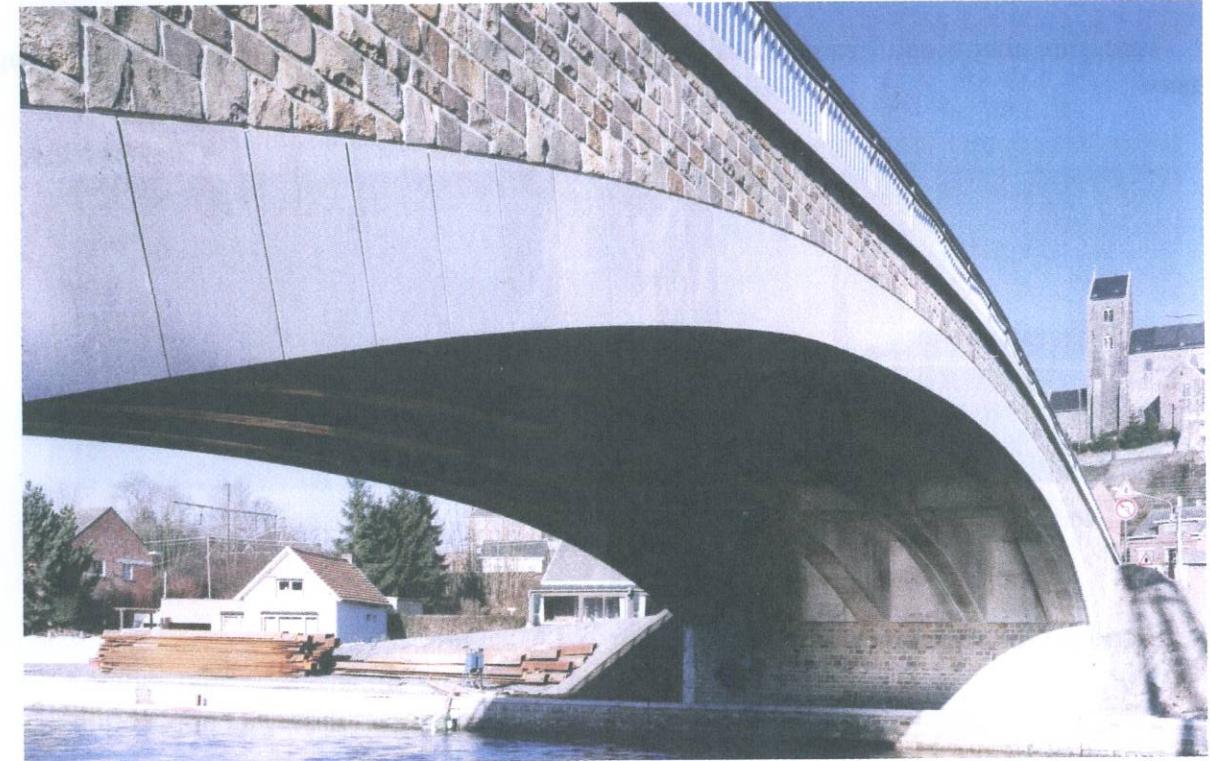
Precast bridge with curved bridge beams. The edges are executed on site with masonry blocks, supported by the bottom flange of the precast beam.
